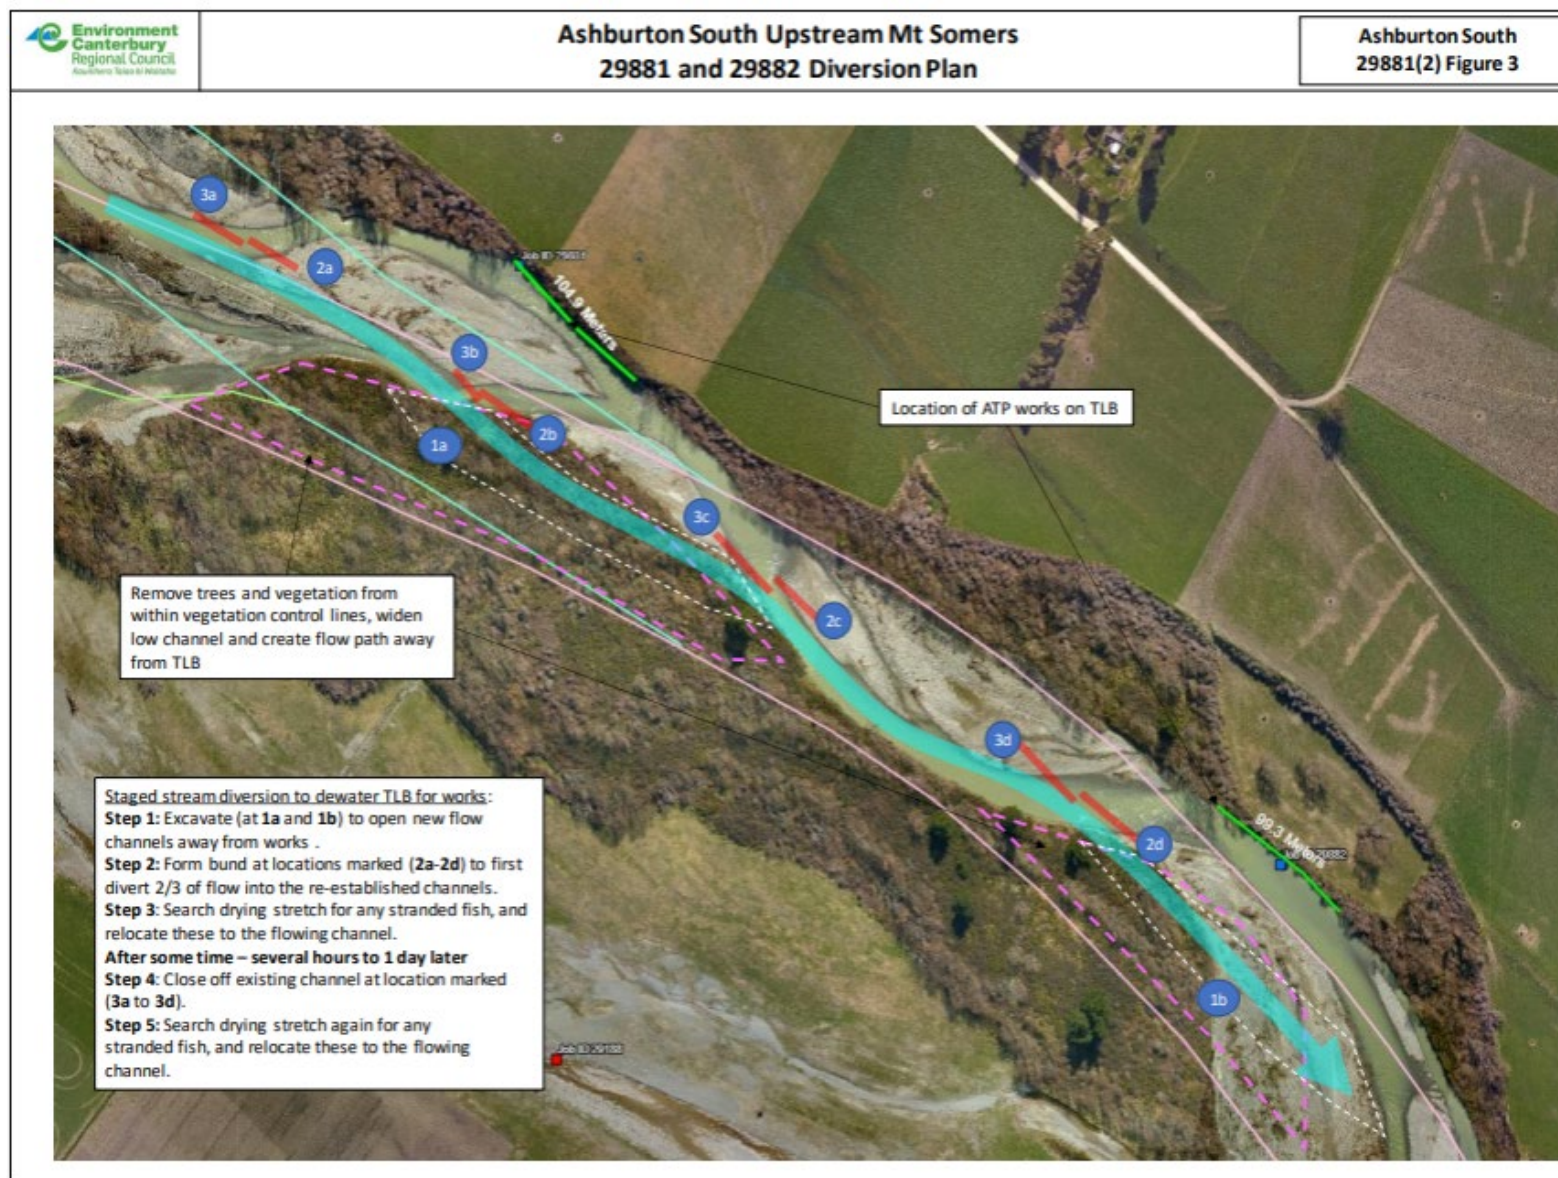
Ashburton South at Mount Somers, diversion plan.
